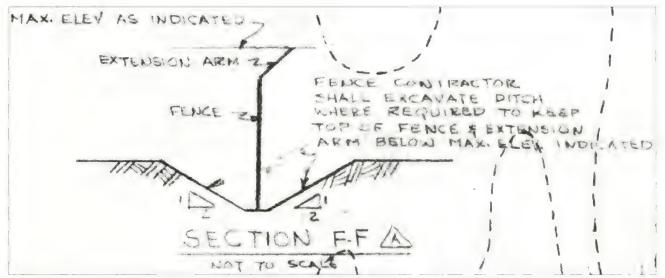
Section of perimeter fence, NIKE Project, Control Area Site Plan, 1954. The fence section indicates that the existing ground should be excavated in order to maintain a consistent top of fence elevation and to avoid interference with the transmission of the radar (GATE 11052).
